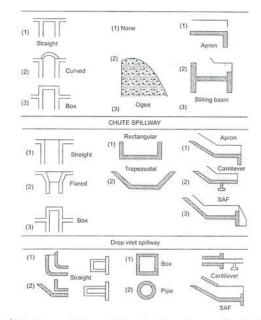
Types of inlet, conduit and outlets. (Source: Suresh, 2009)
